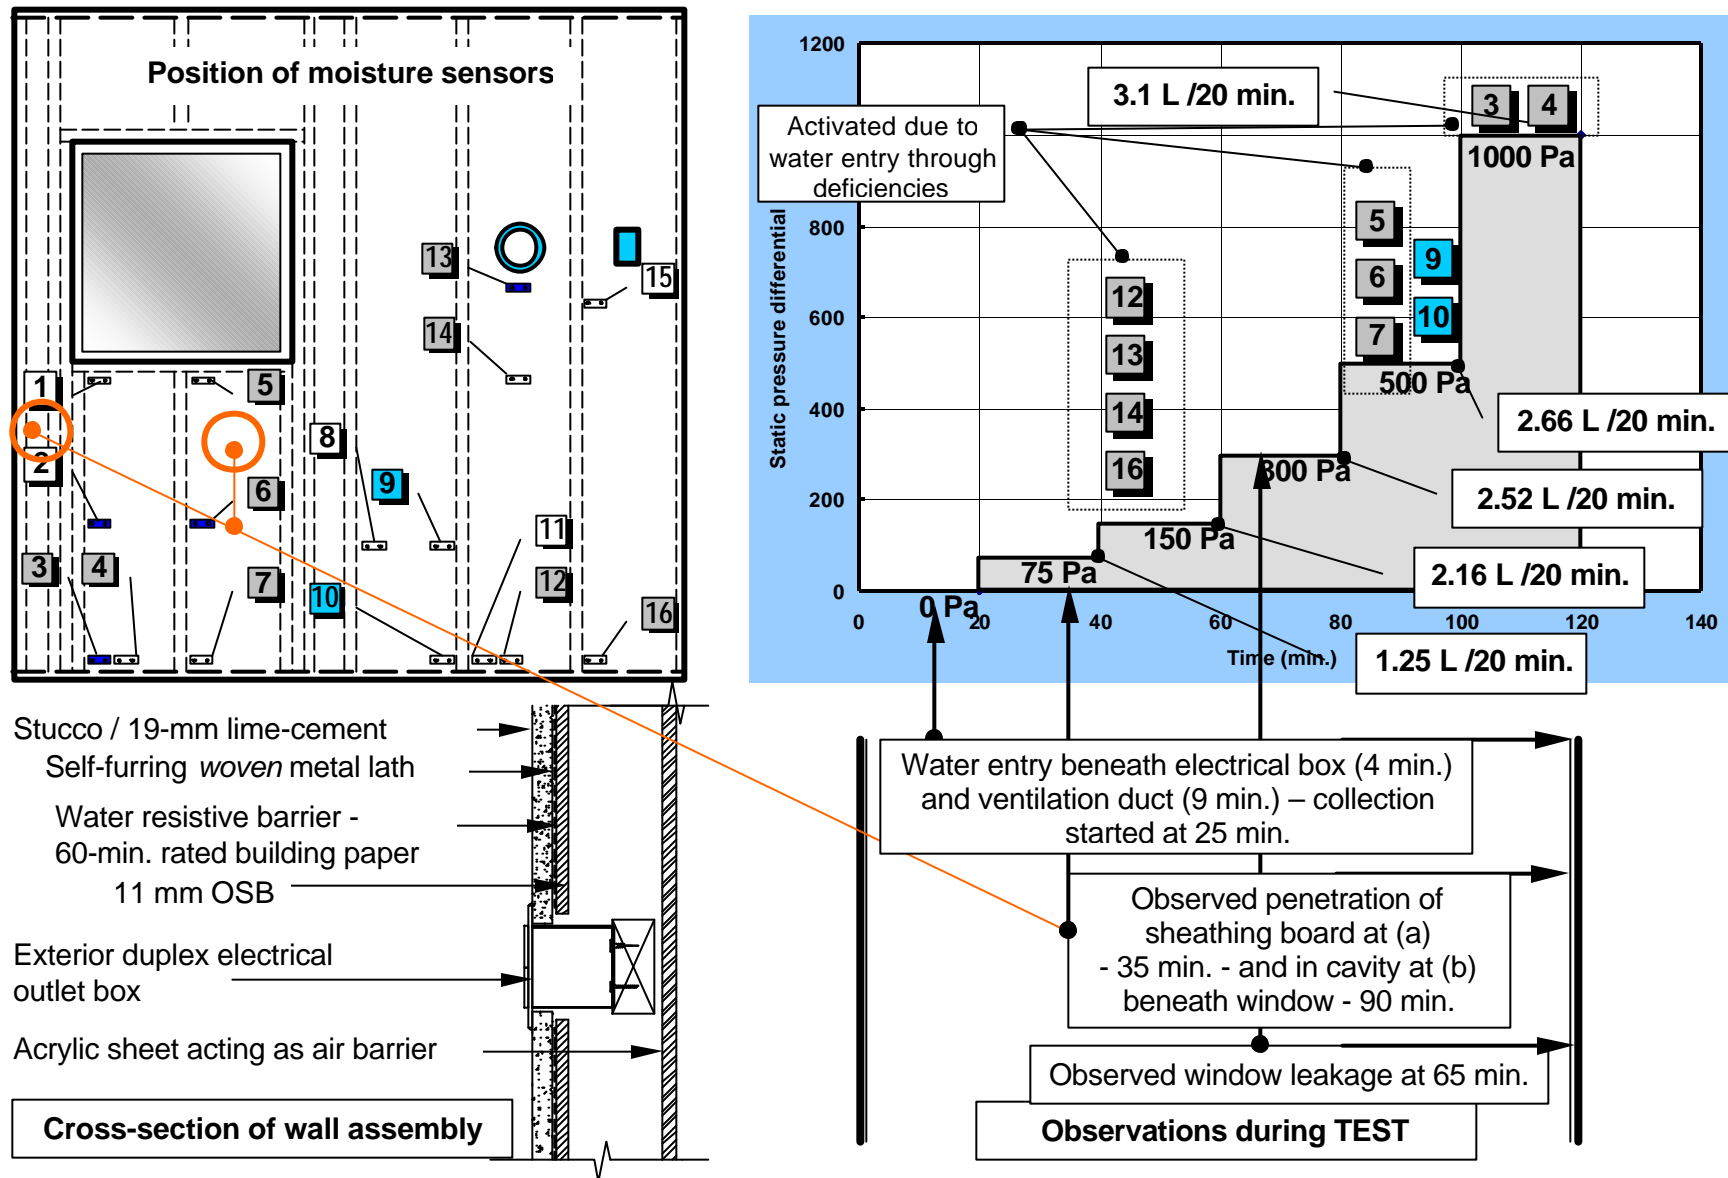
Stage 2 Water penetration of WA-2A - Static test on Stucco-clad walls
